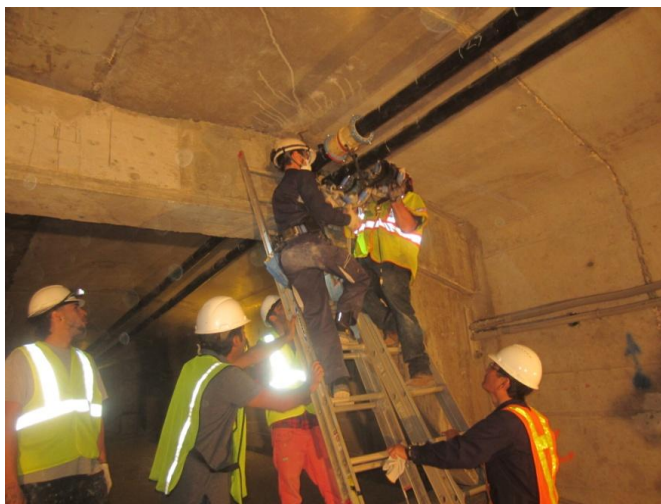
Installation of a magnetizer on a horizontal section at high elevation.
